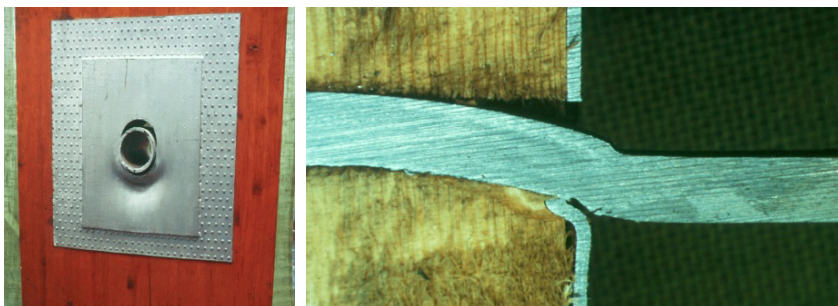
A joint with tube fasteners that has been reinforced with nail-plate connectors (left), Close-up view of cross-section with reinforced joint and embedment deformations of the reinforcement (right).
